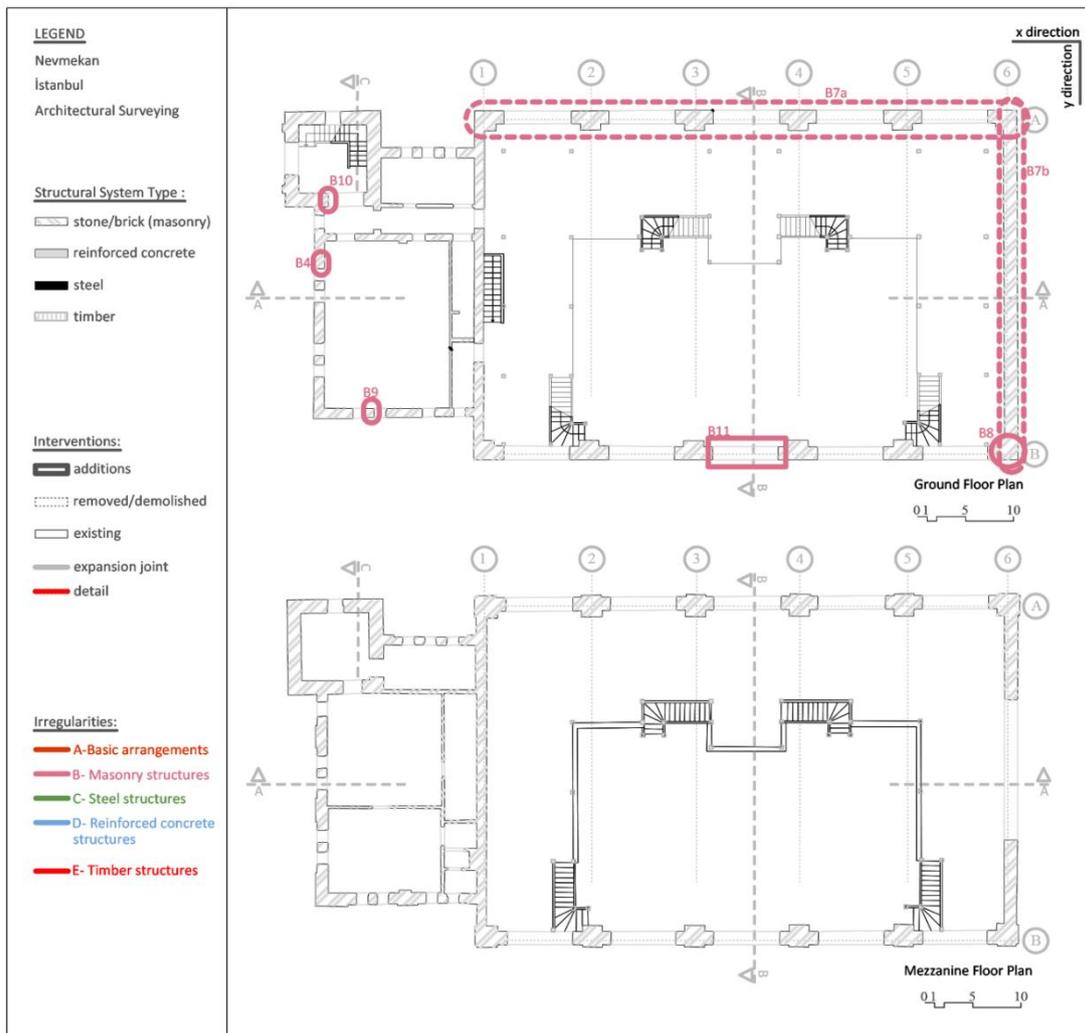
Nevmekan restoration project floor plans (Adapted from Köroğlu, 2019)
